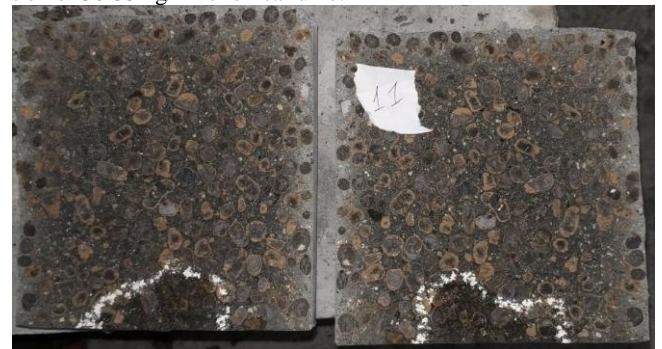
An example of a structure of shipbuilding expanded clay lightweight concrete (a cylinder that was split in half after a watertightness test)
